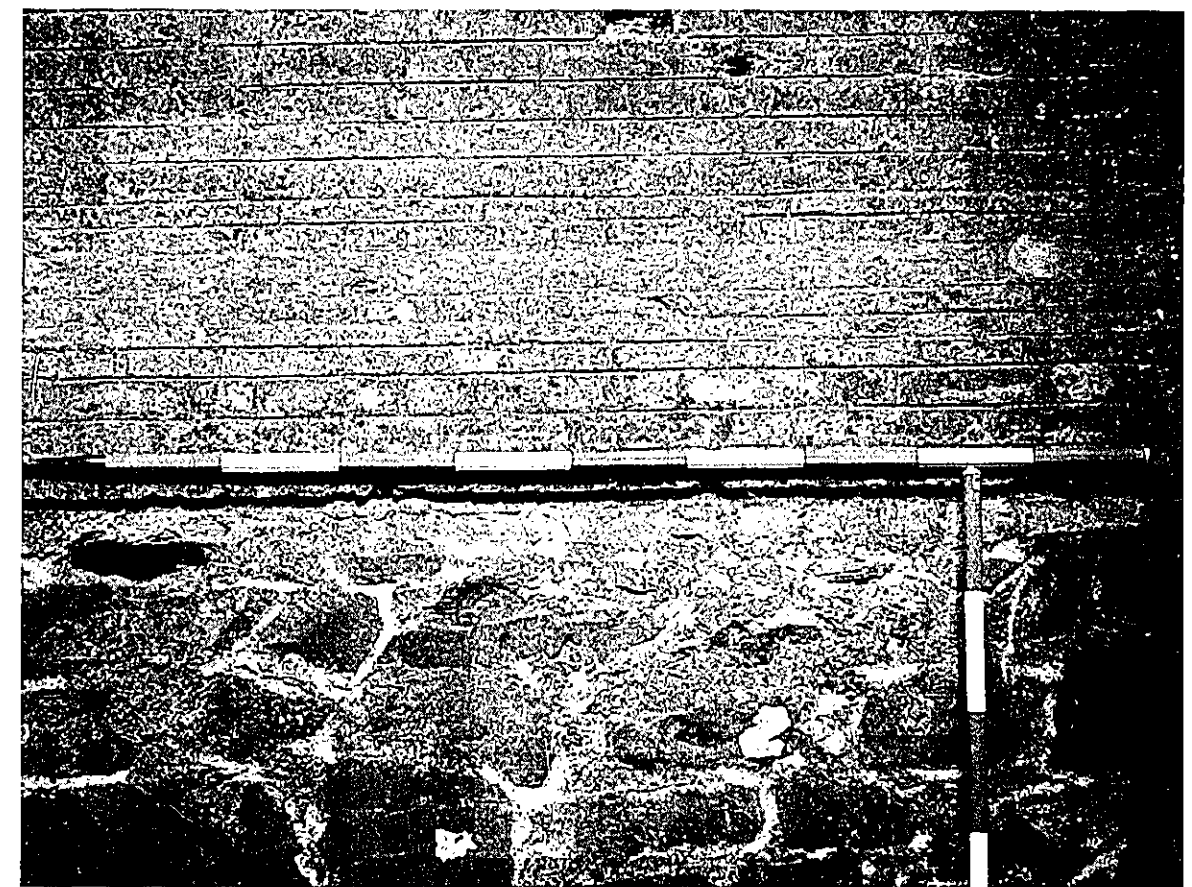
Yellow stringcourse in curvilinear design on west wall of east wing dividing basement random rubble from first floor red brick.
